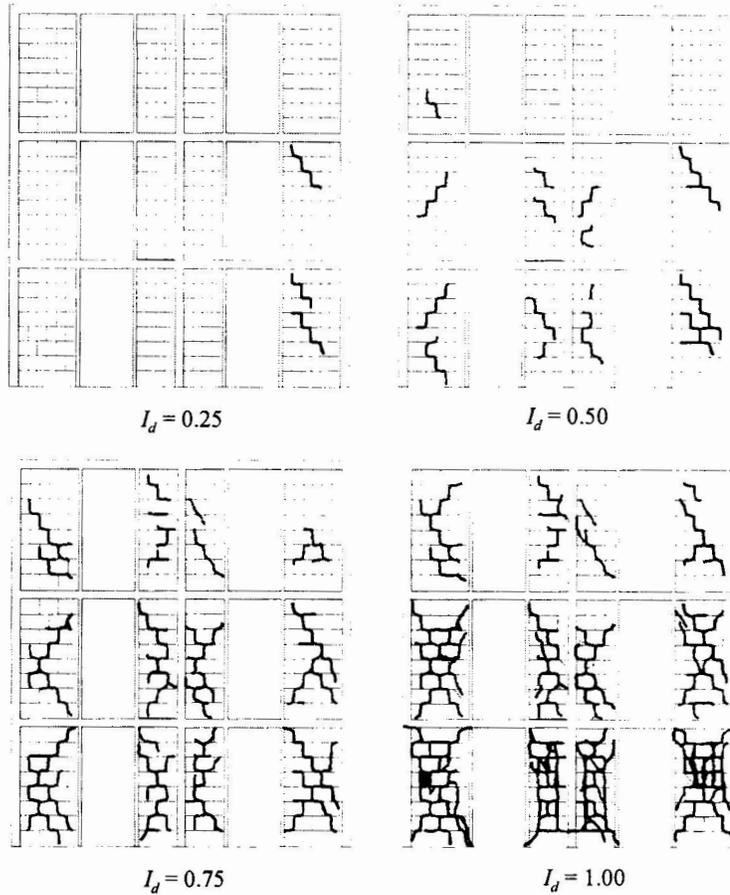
Definition of damage indexes I_d in the case of a confined masonry building model
